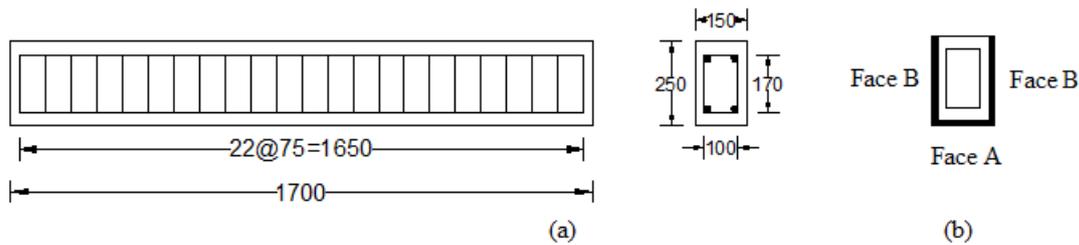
FEA validated models of beams (a) geometry and reinforcement details; (b) CFRP reinforcement layout (mm).
